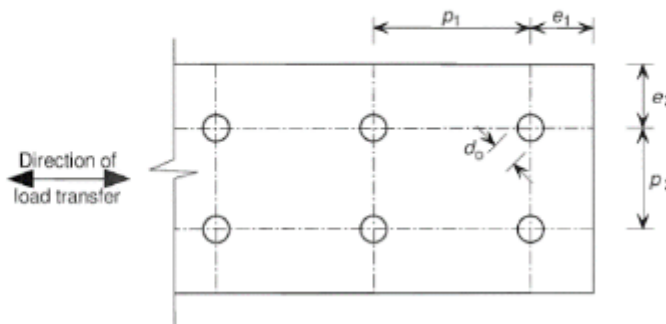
End distance, edge distance and spacings for fasteners and spot welds
